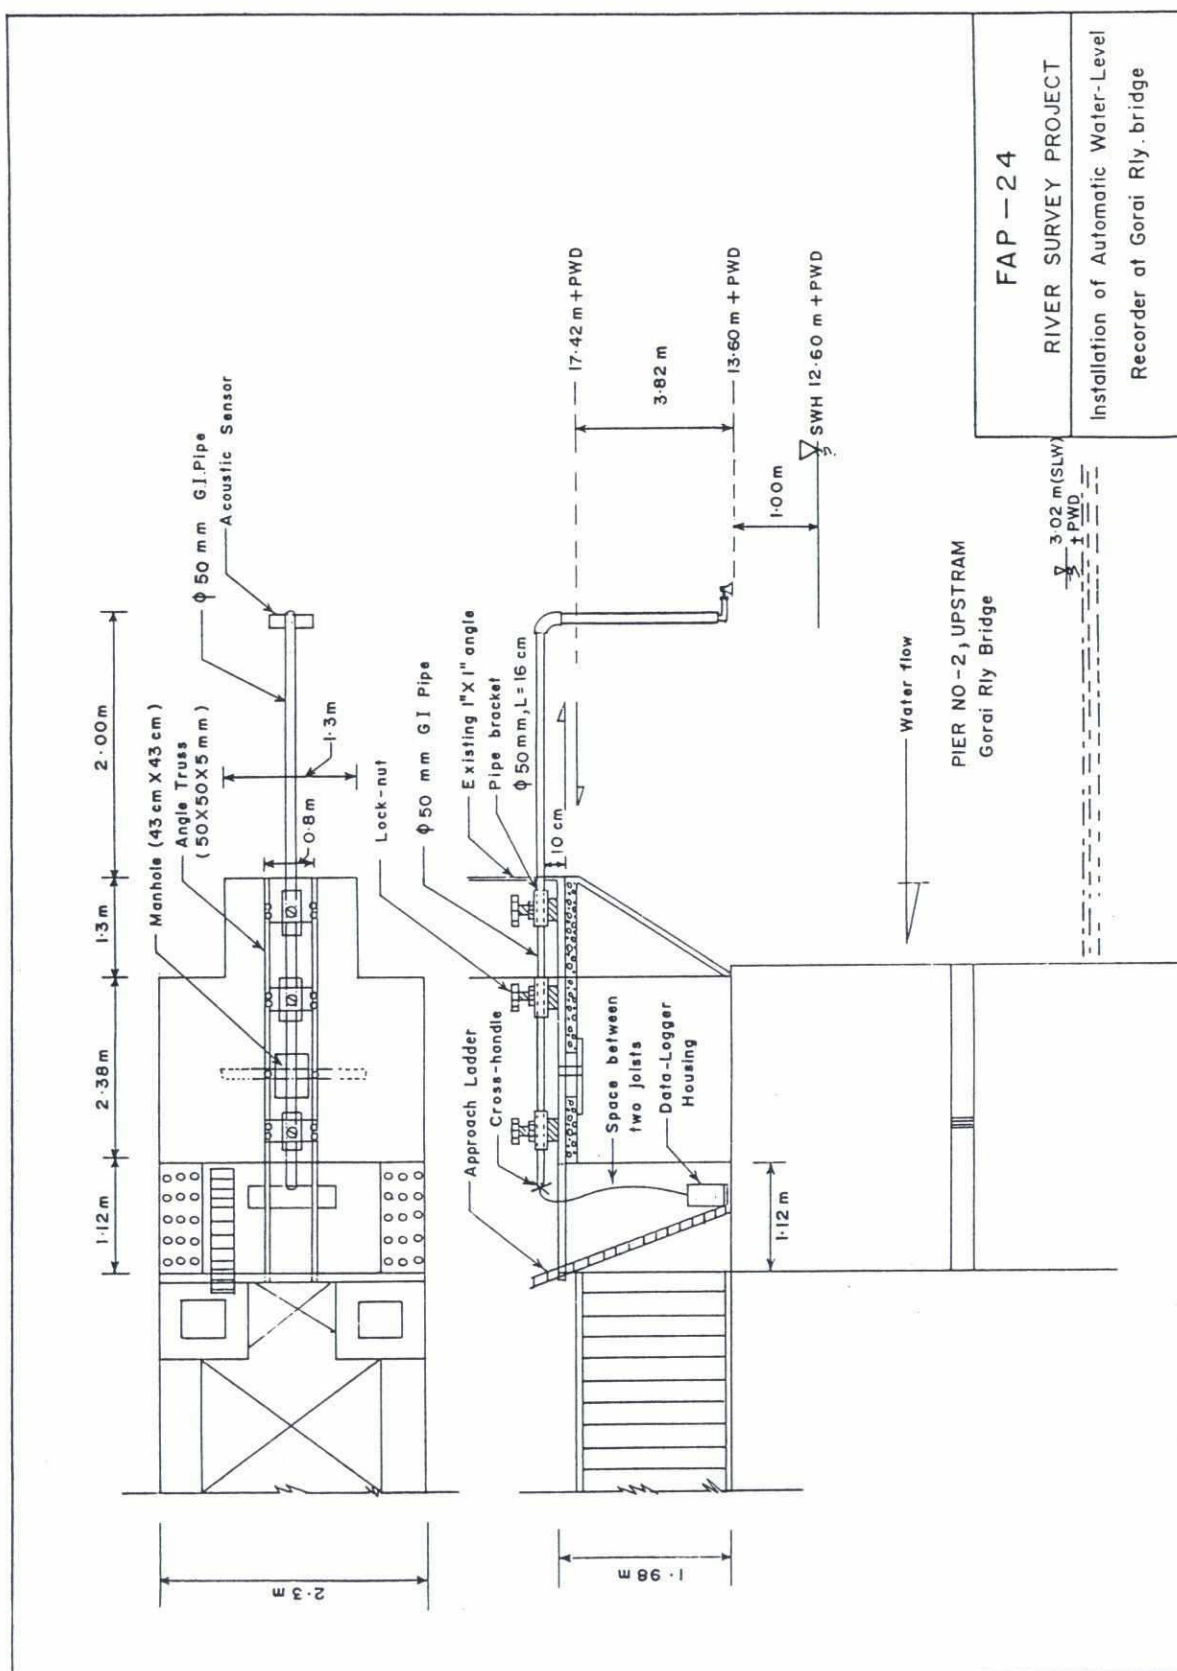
The design elements of the AWLR fixing at the Railway Bridge pier at Kushitia
